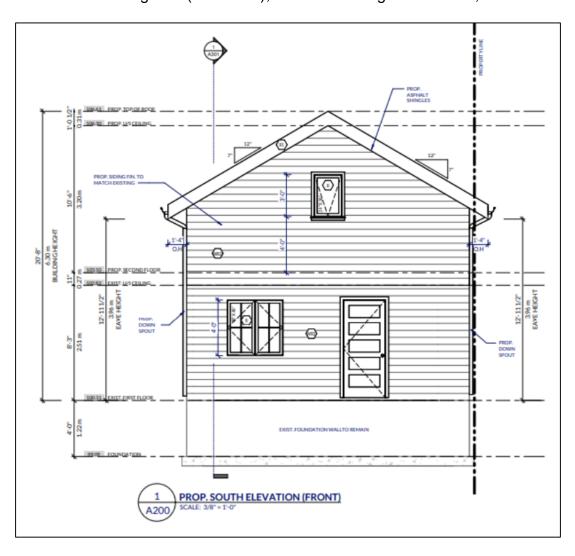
South Elevation (Front) proposed via Application A2024-090.
